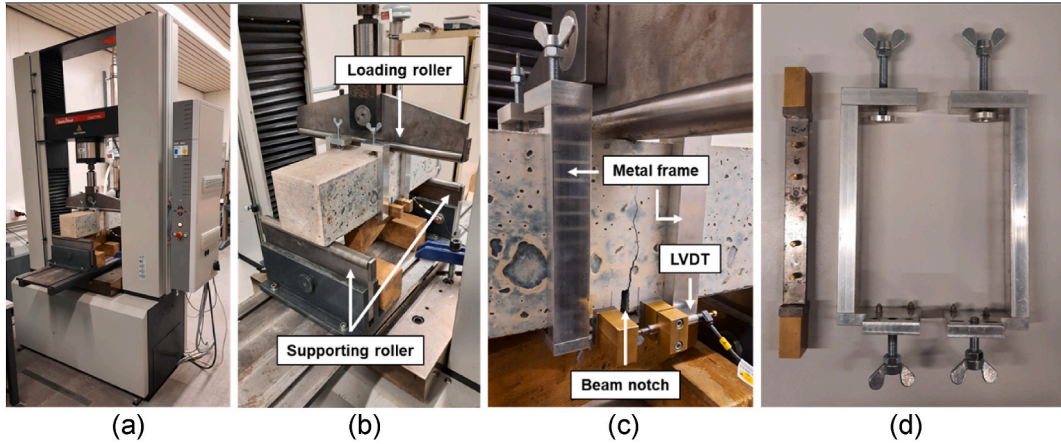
Three-point bending test experimental setup: (a) testing machine, (b) arrangement of loading, (c) metal frame equipped with LVDTs, and (d) detail of the metal frame.
